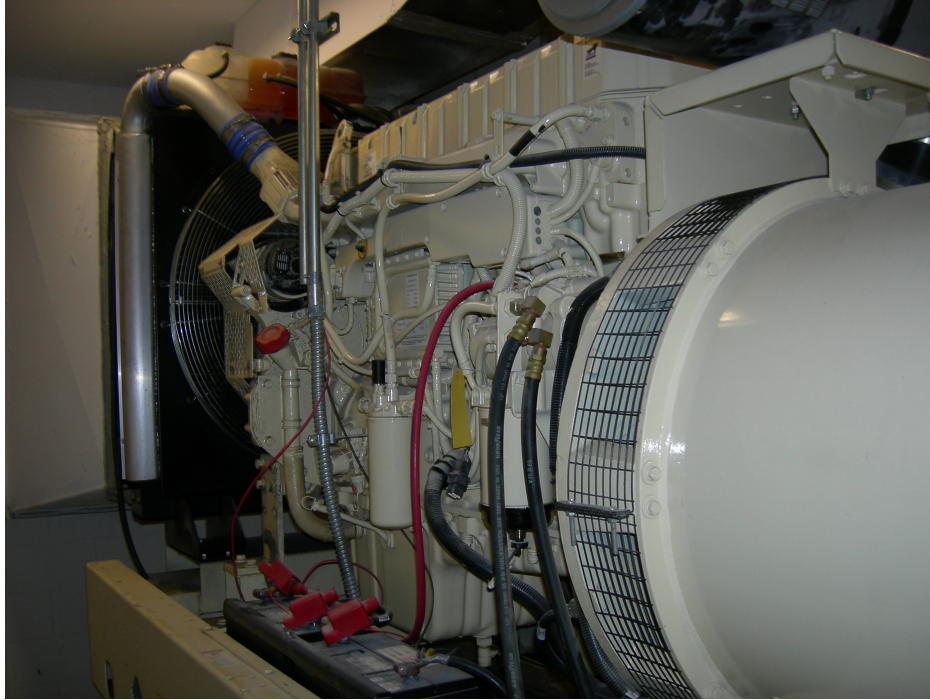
Savoy Motor Generator Set-Right Side View
